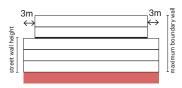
Diagram demonstrates the relationship between height, street wall height, boundary wall and building separation (5 storeys)
